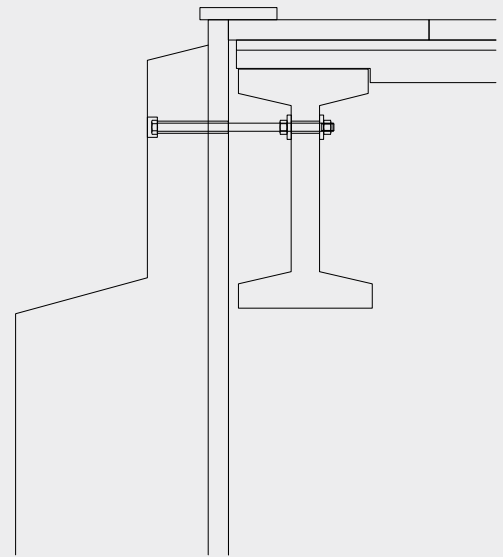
Double-tee panel connection to perimeter beams used in industrial buildings.
